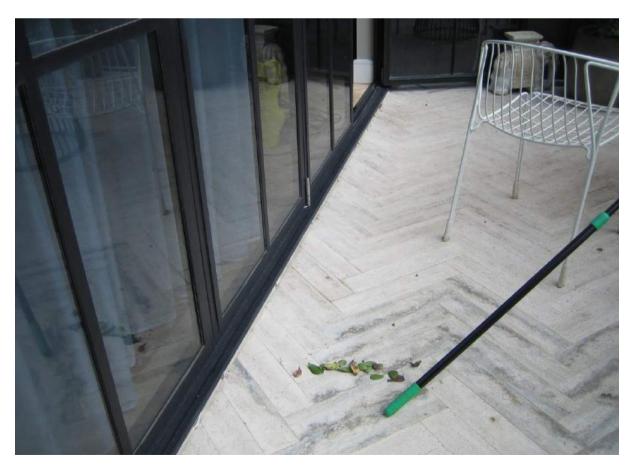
Water penetration and cracked tiles at living room balcony doors in Unit 407.
